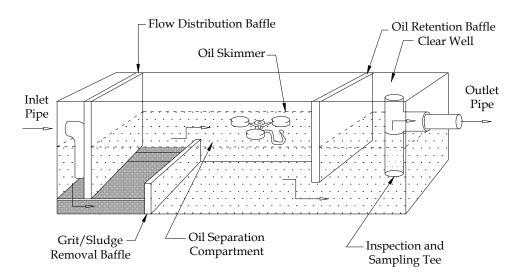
A Typical Minor SBTR Trap Arrangement
